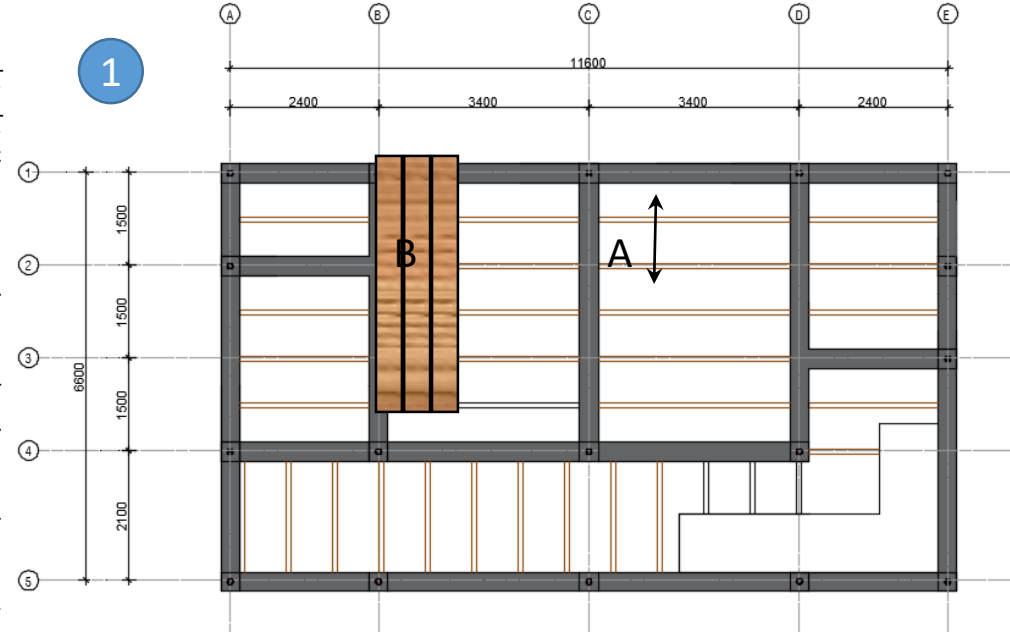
24.Positioning of wooden rafters on steel rolled box sections
